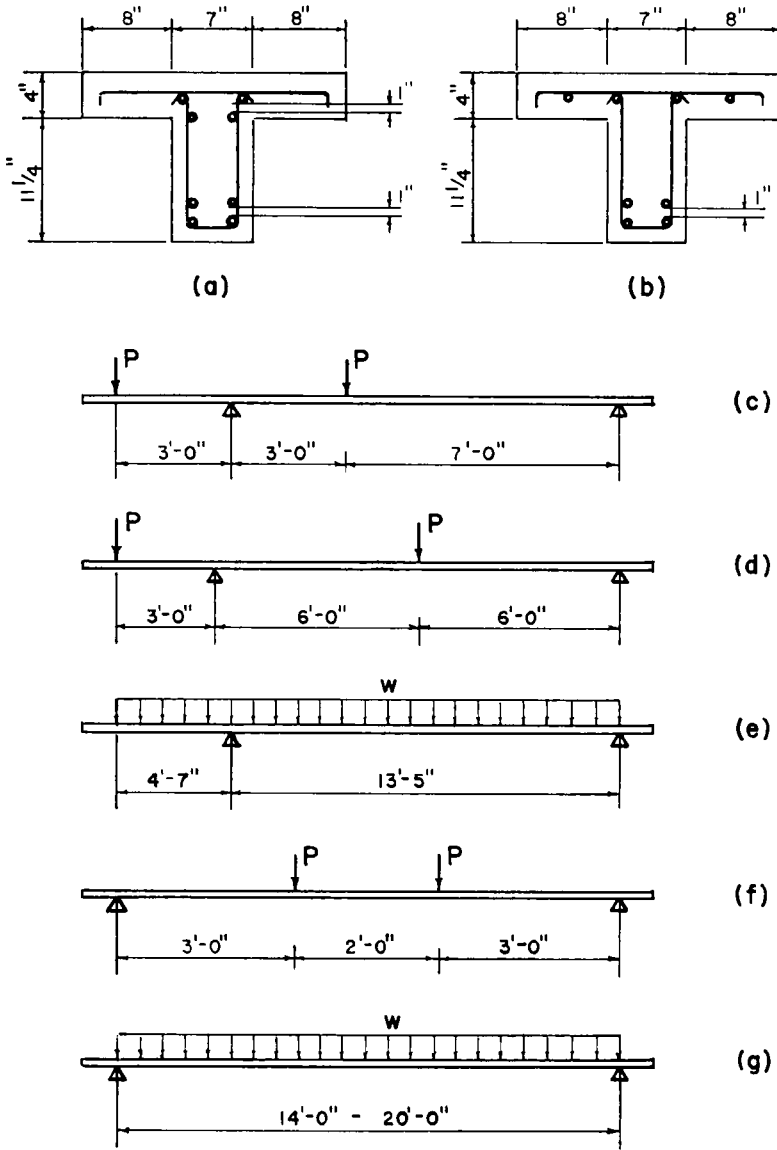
Beam specimens of Cornell University tests on high-strength reinforcement.
